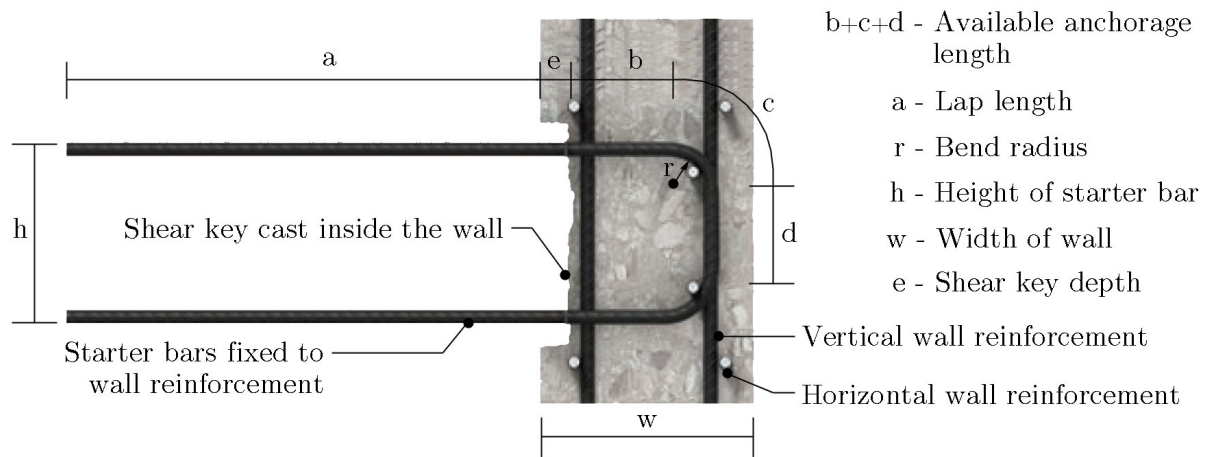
Cast-in Starter-bar Anchorage Detail (reworked from Ancon Building Products (2014))
